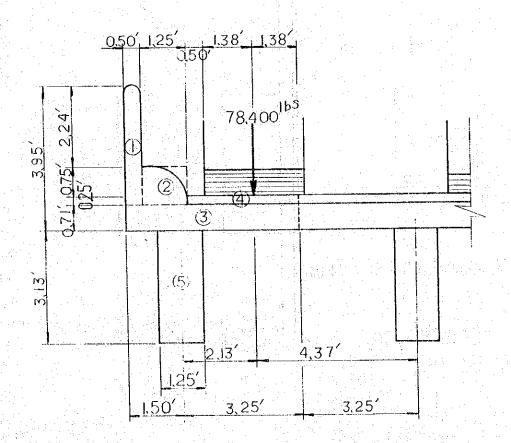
LOAD FOR EXTERIOR GIRDER
